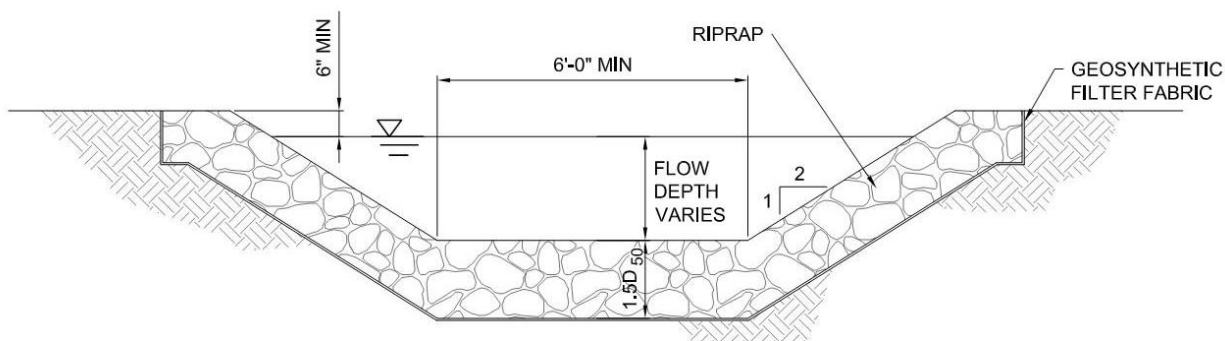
Typical Cross-section for Re-established Drainage Channel over non-Pit Backfill Reclaimed Areas
